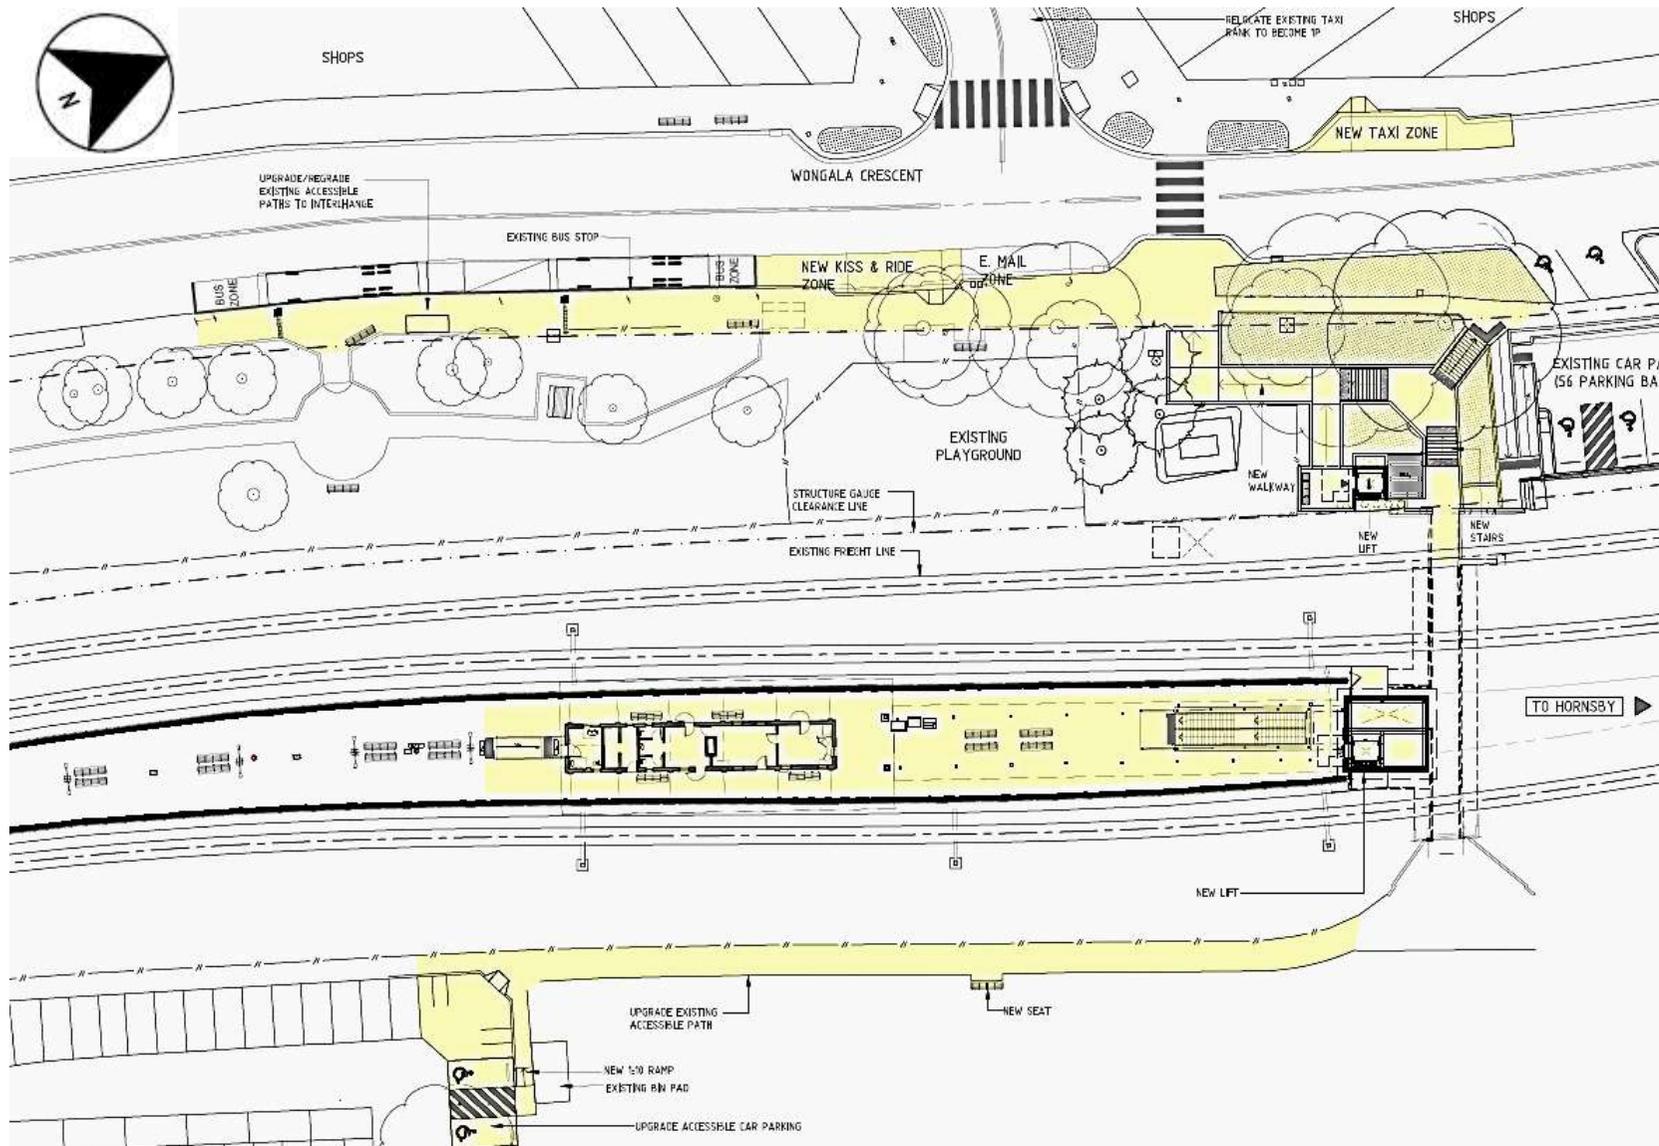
Beecroft Railway Station – Proposed Works – Affected areas are highlighted in Yellow. (Source: CCG Architects)
